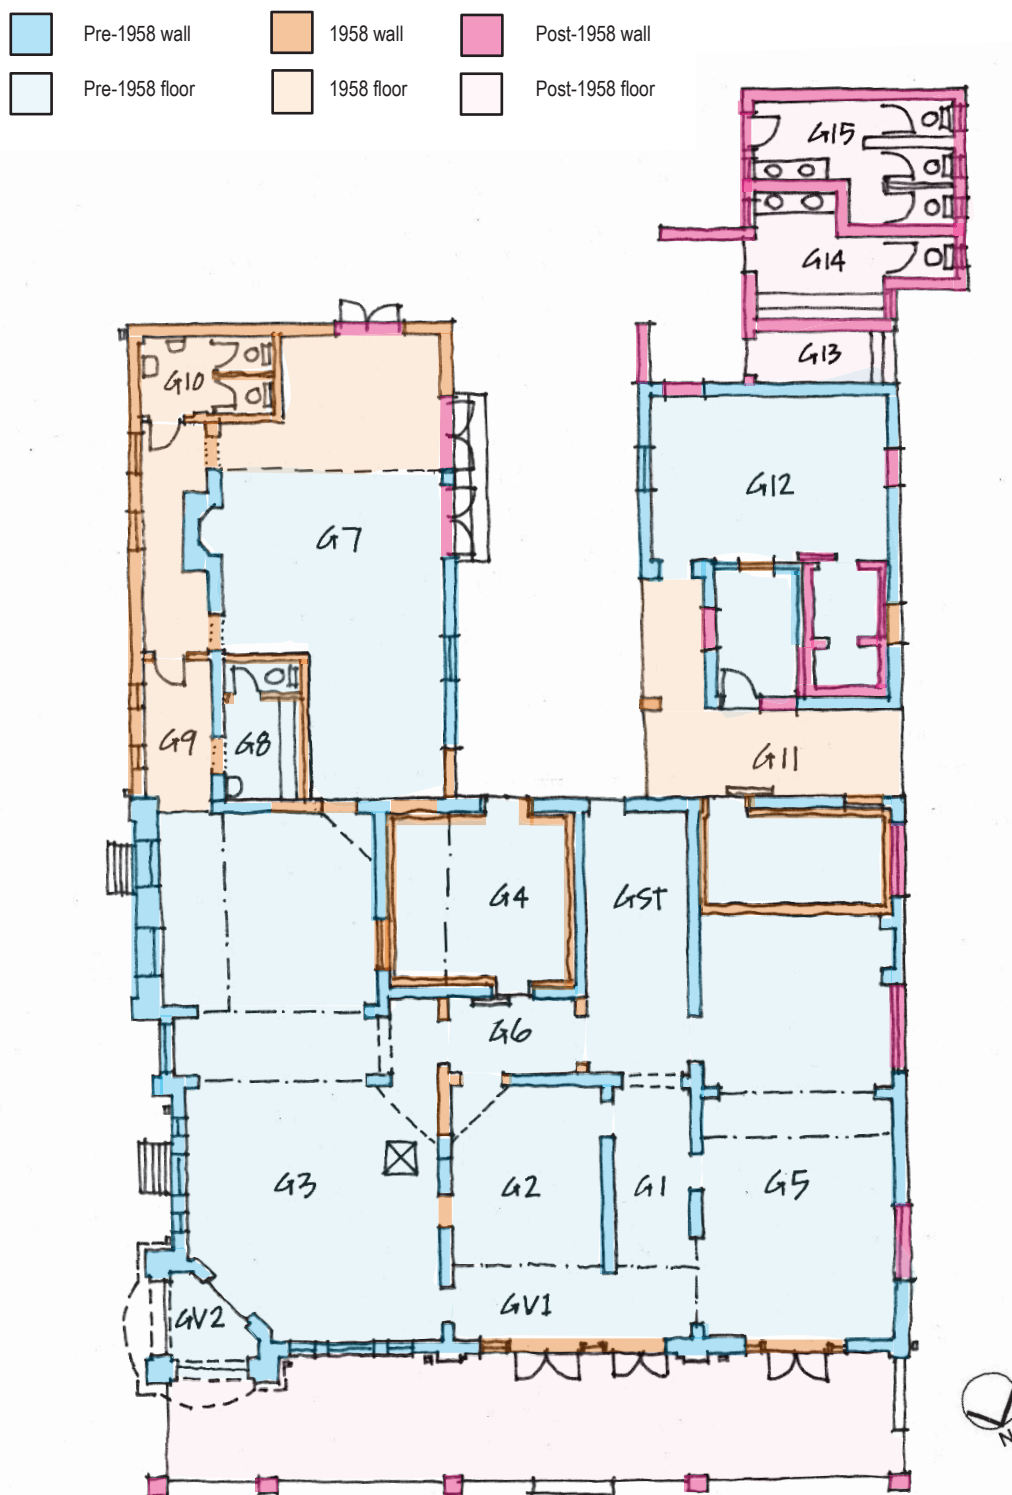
Diagrammatic ground floor plan showing existing fabric from different eras
